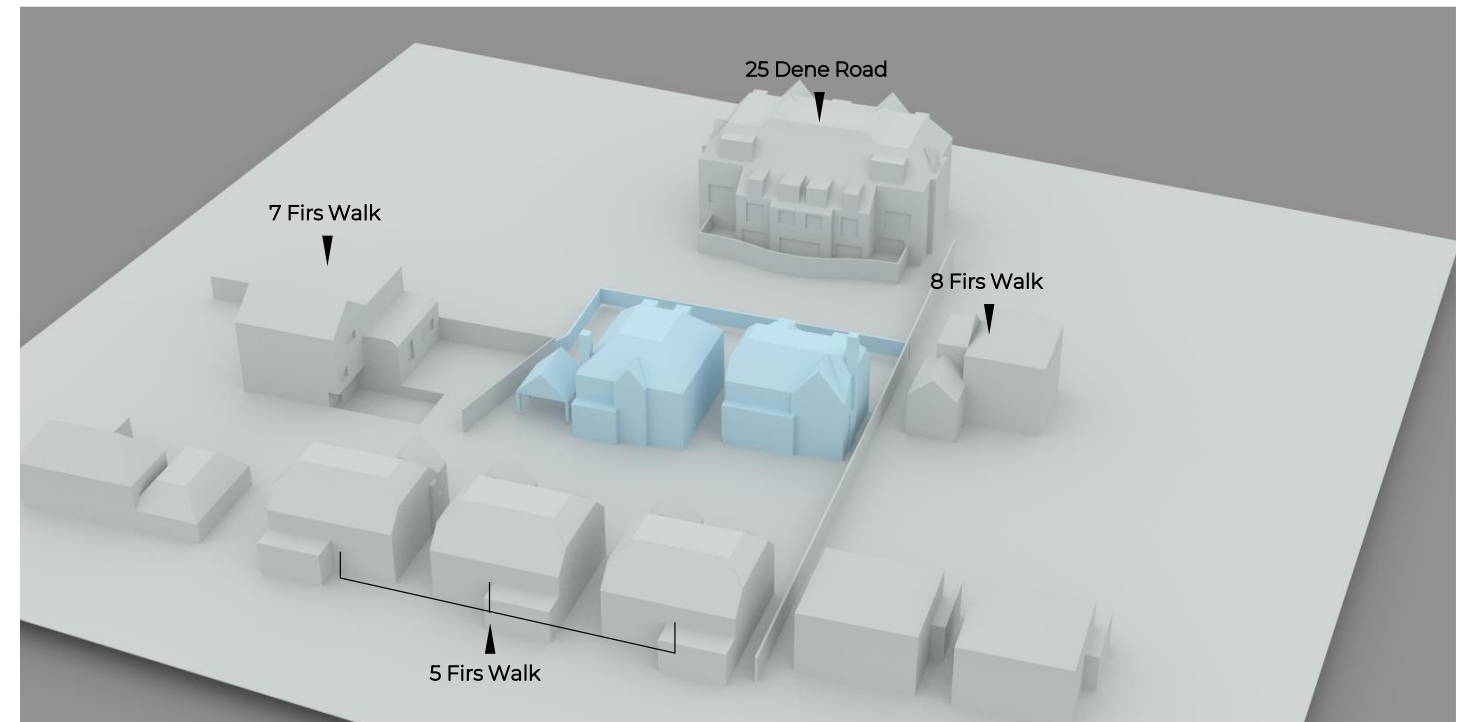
Technical 3D model of 6 Firs Walk and surrounding context, with the proposed development in place (view from southeast).
